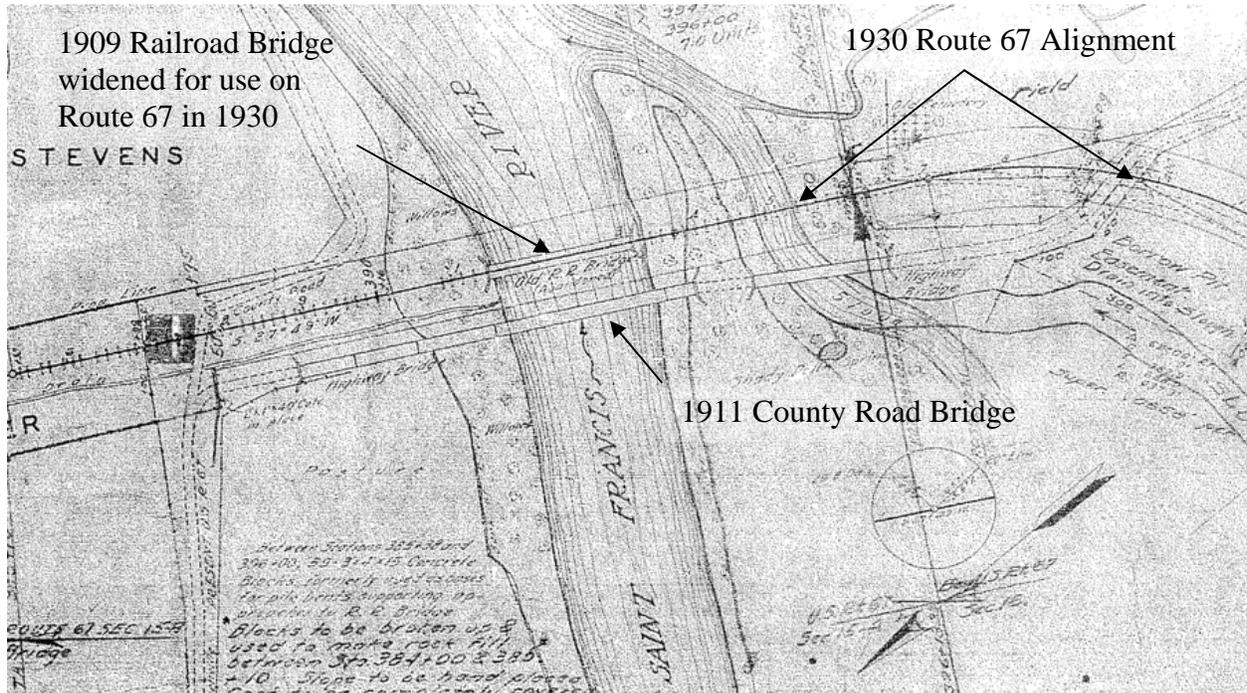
A portion of the highway plans for 1929-30 Route 67 Section 15A improvements illustrating the realignment of Route 67 at the St Francis River showing both the 1911 highway bridge and the abandoned Pratt through truss railroad bridge erected there in 1909, which was to be widened for use by Route 67.
